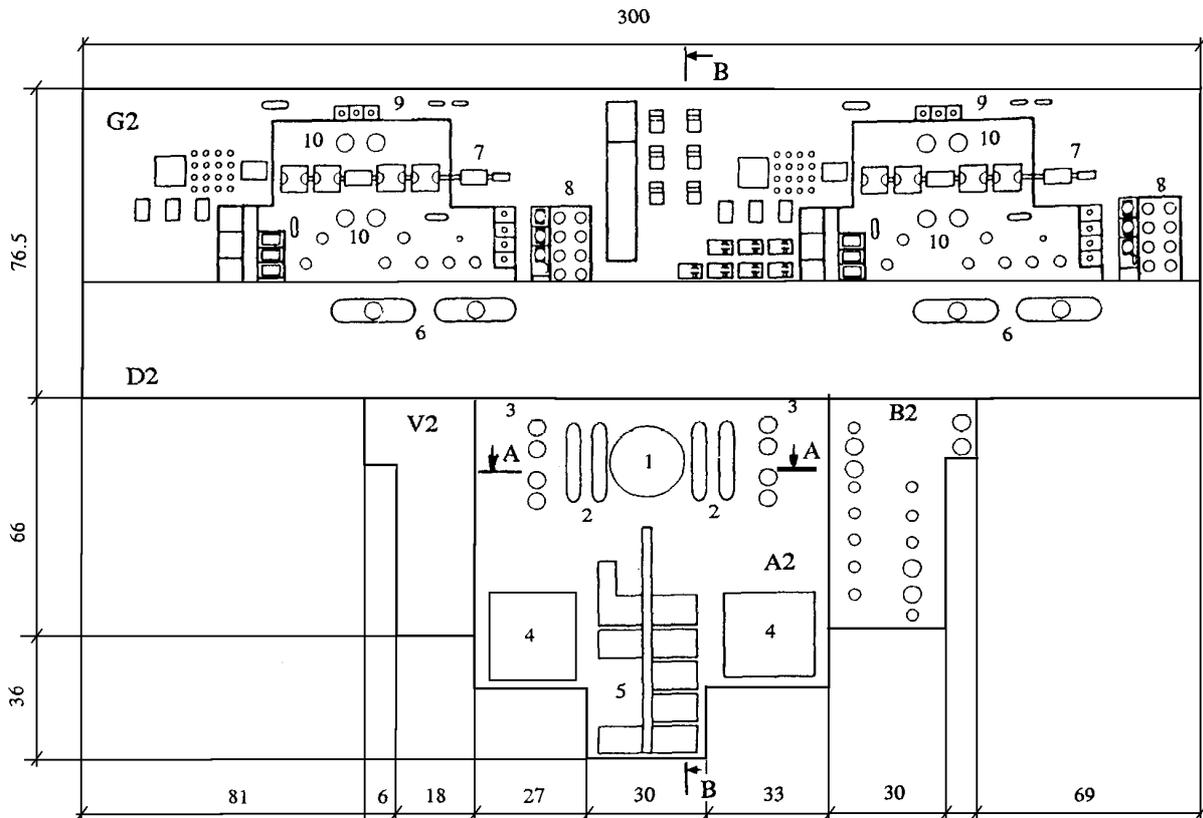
Plan of the Ignalina NPP main buildings [2]
